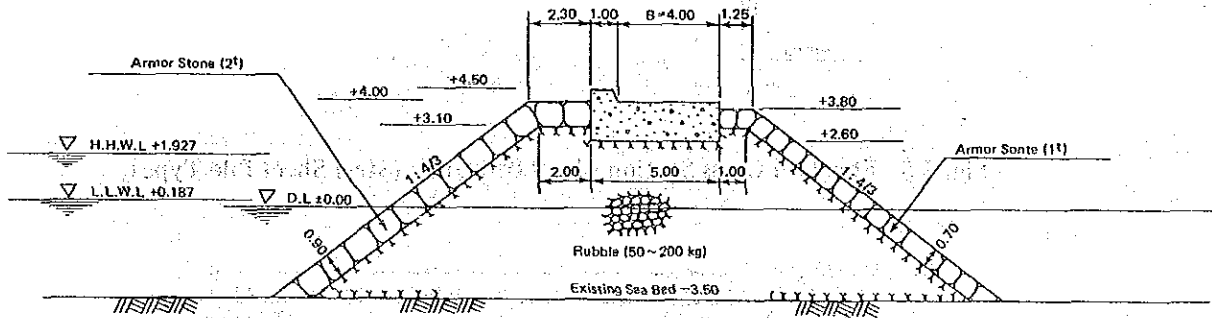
Standard Cross Section of East Breakwater (I) (B=4.00m)
